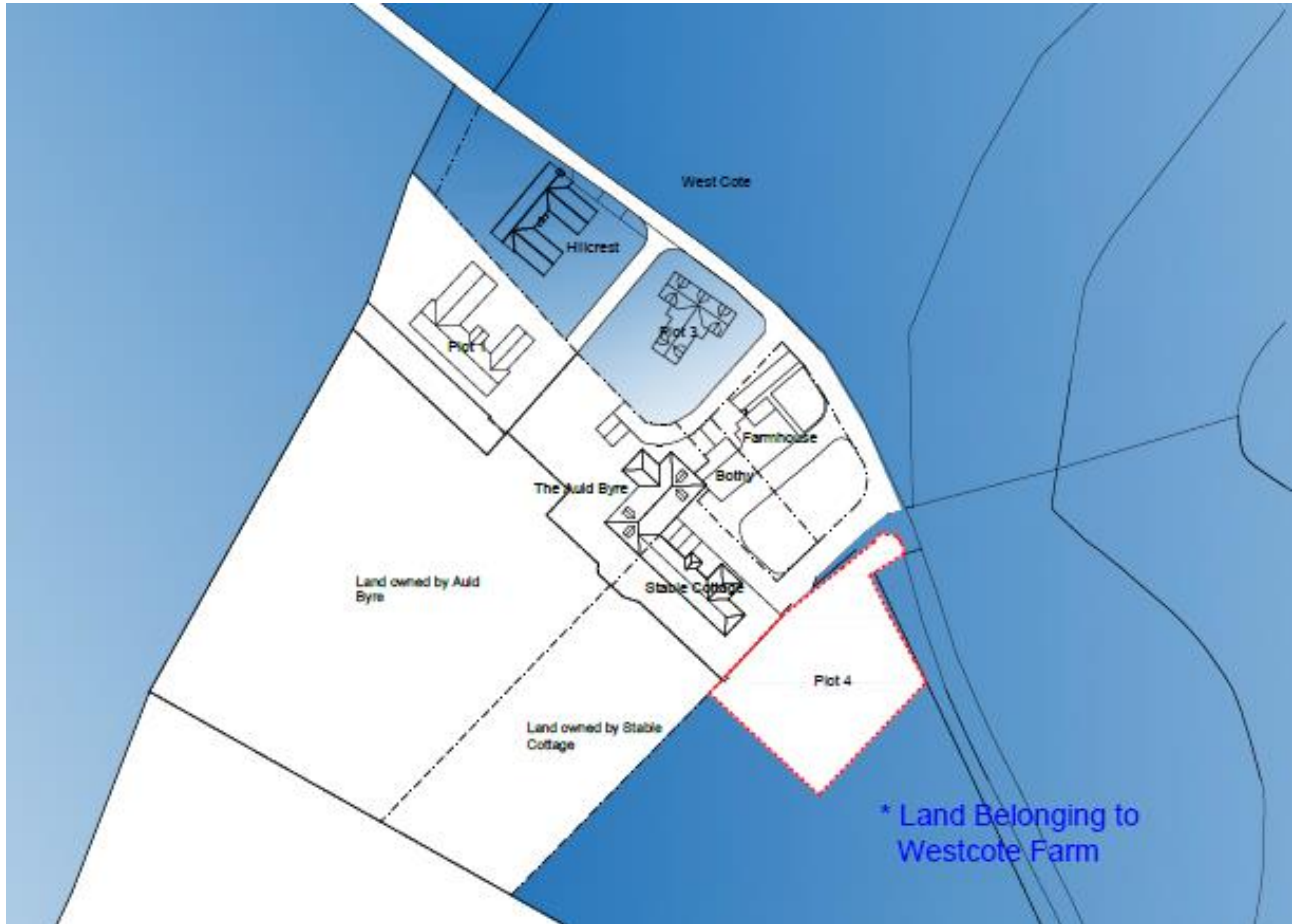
Extract from AT3514-L(-1)101(A) Location Plan, the application site is visible as a south-east bookend to the existing Building Group at Westcote (Source: Aitken Turnbull Architects).
